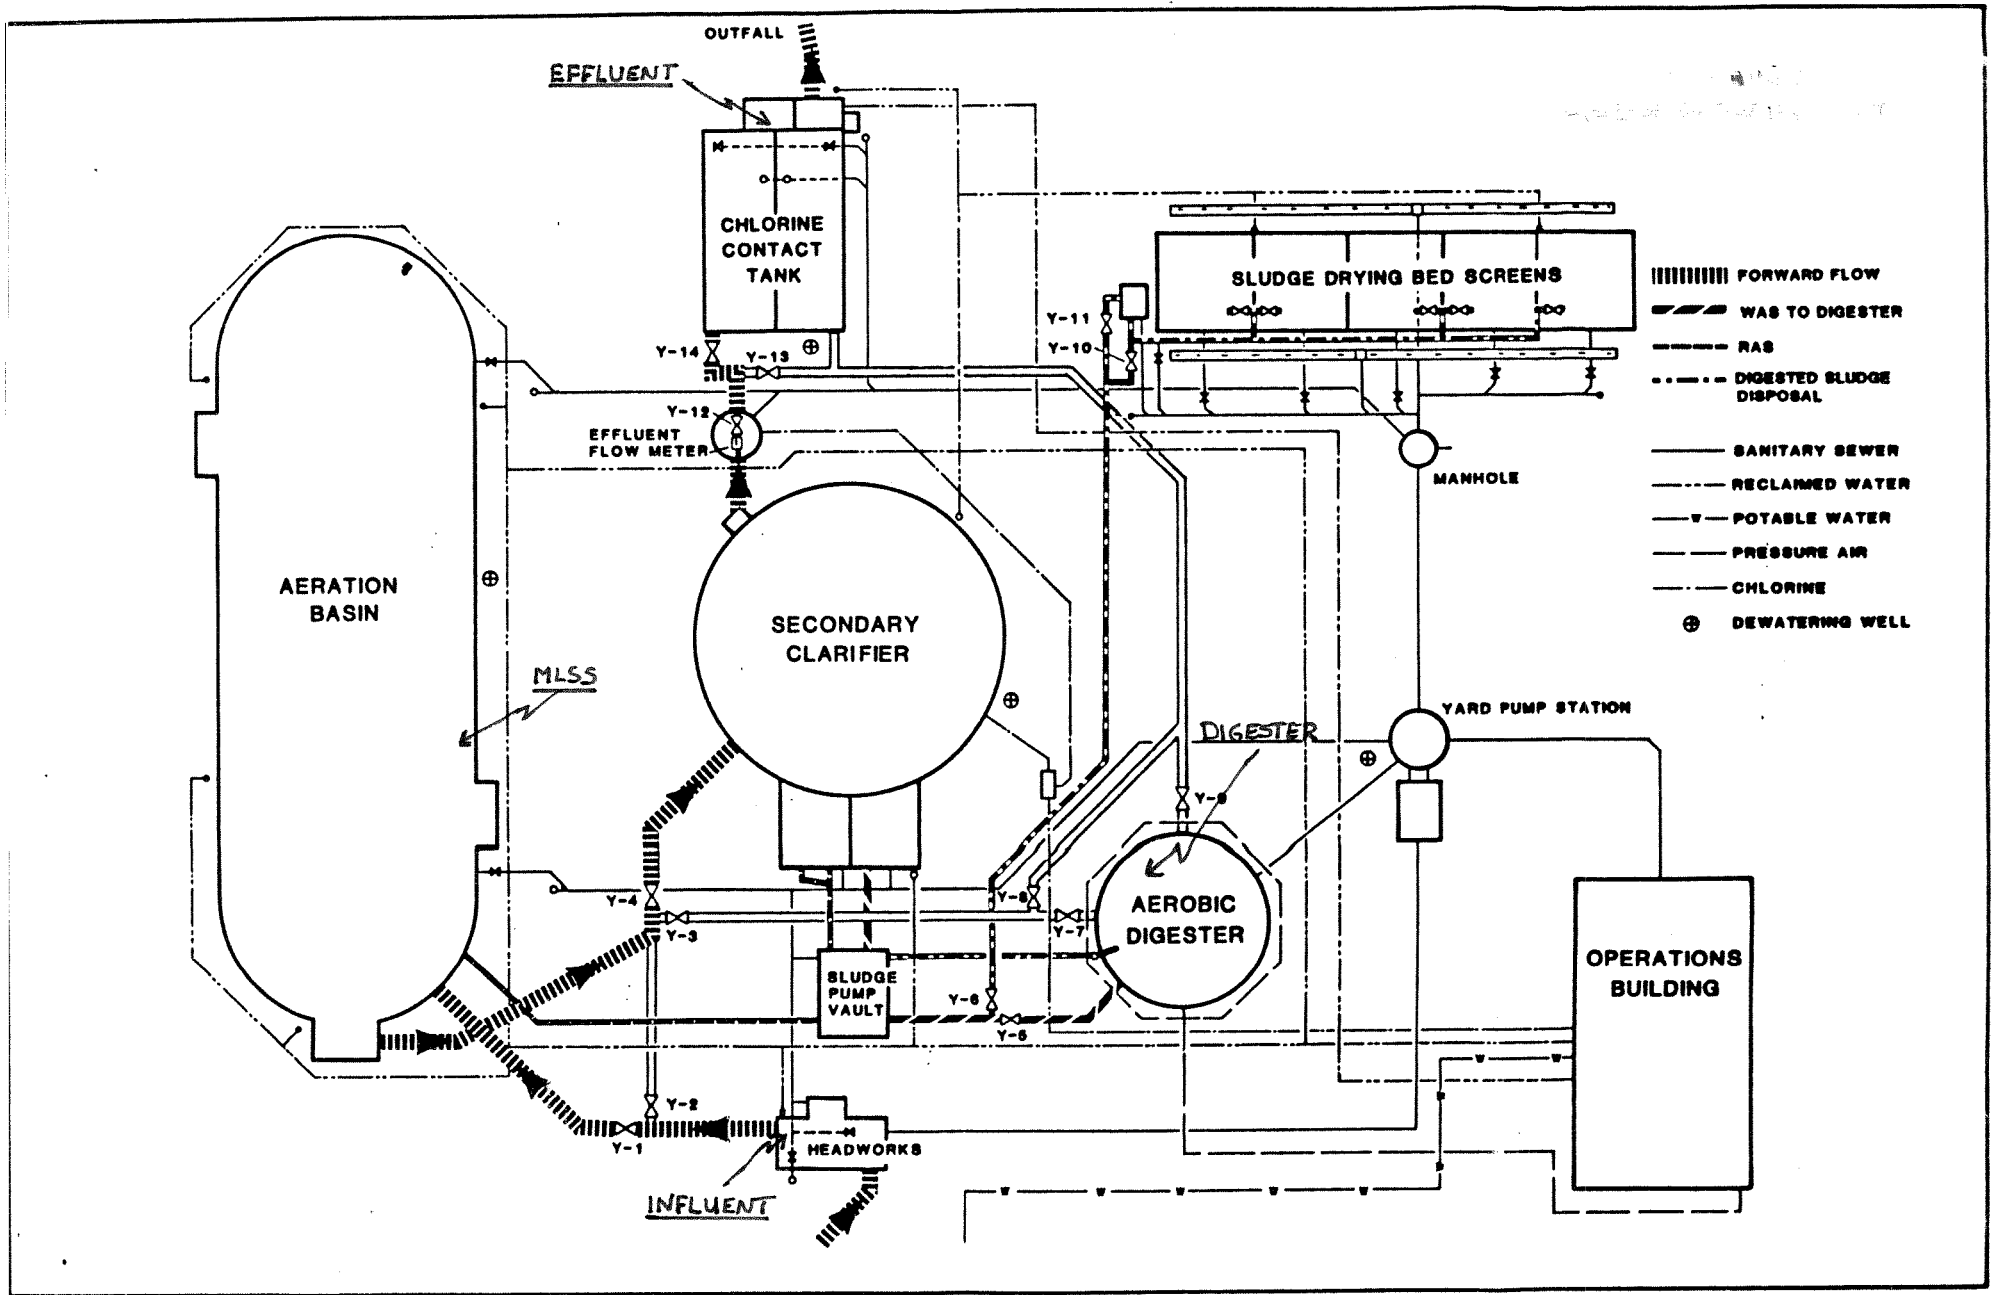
Plant layout and sampling locations - Coupeville 1985.
